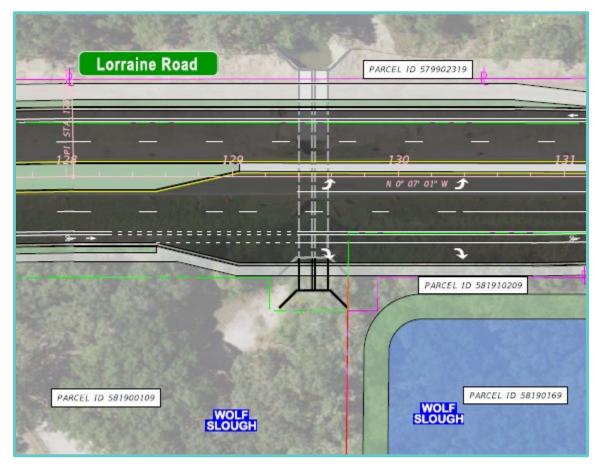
| Concrete Box Culvert NB2055 Extension
